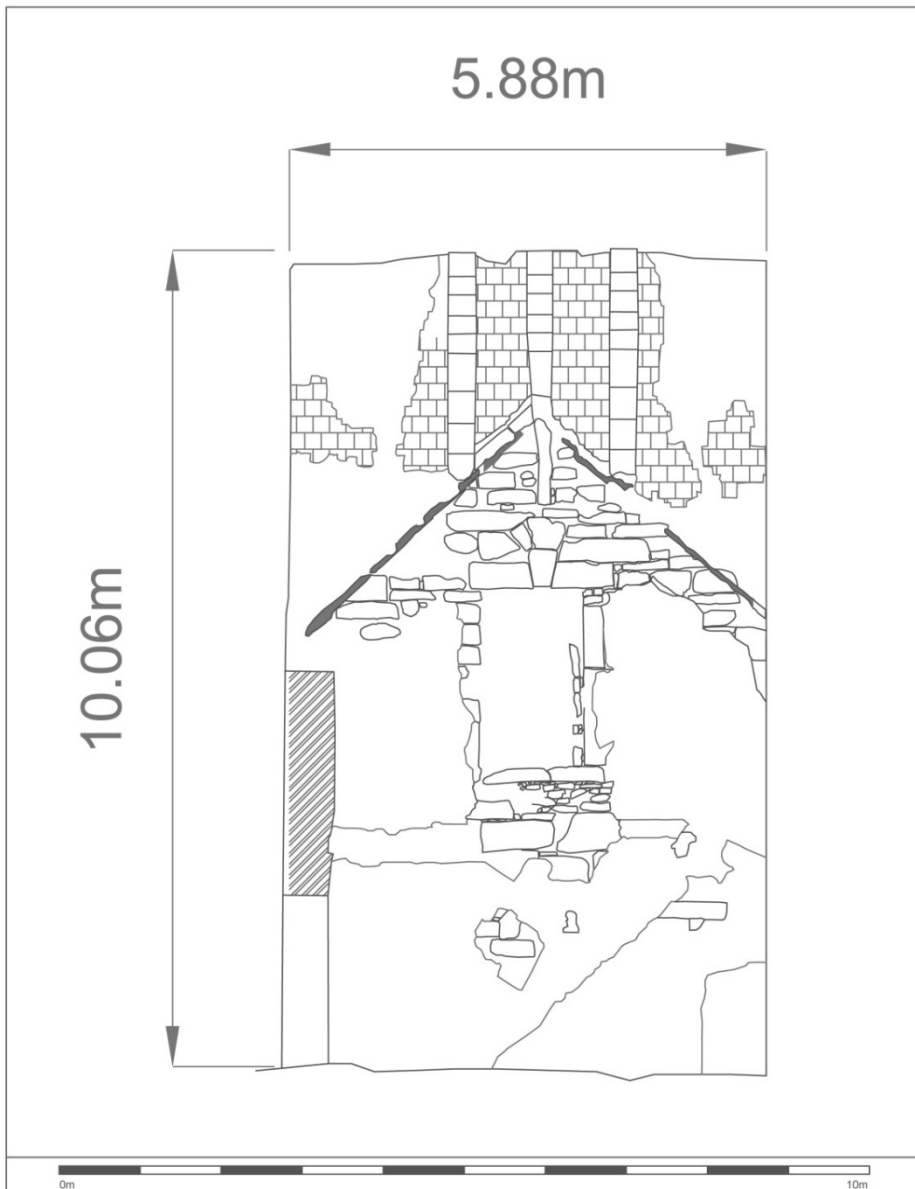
South-west External elevation of the south-west wall of the signal tower at Inishmore Signal Station.
